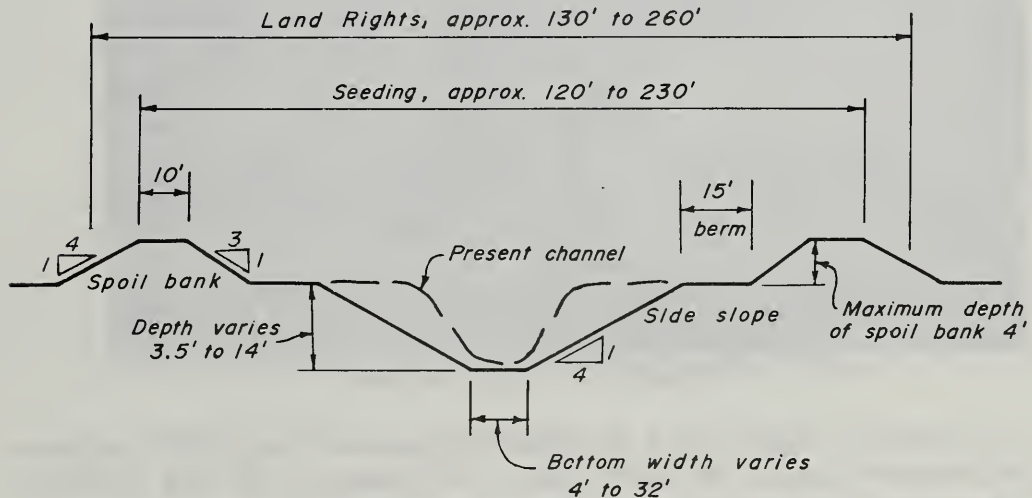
Typical Cross Section of Planned Channel Without Adjacent Road.
